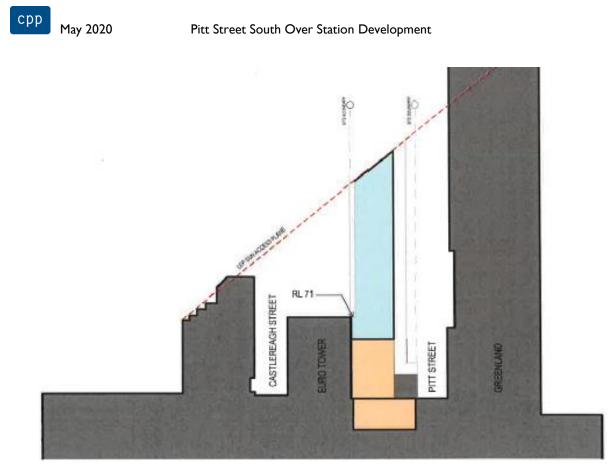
Pitt Street South concept SSD DA – East-West section [Source: SSD 8876 Concept Stamped Plans]
